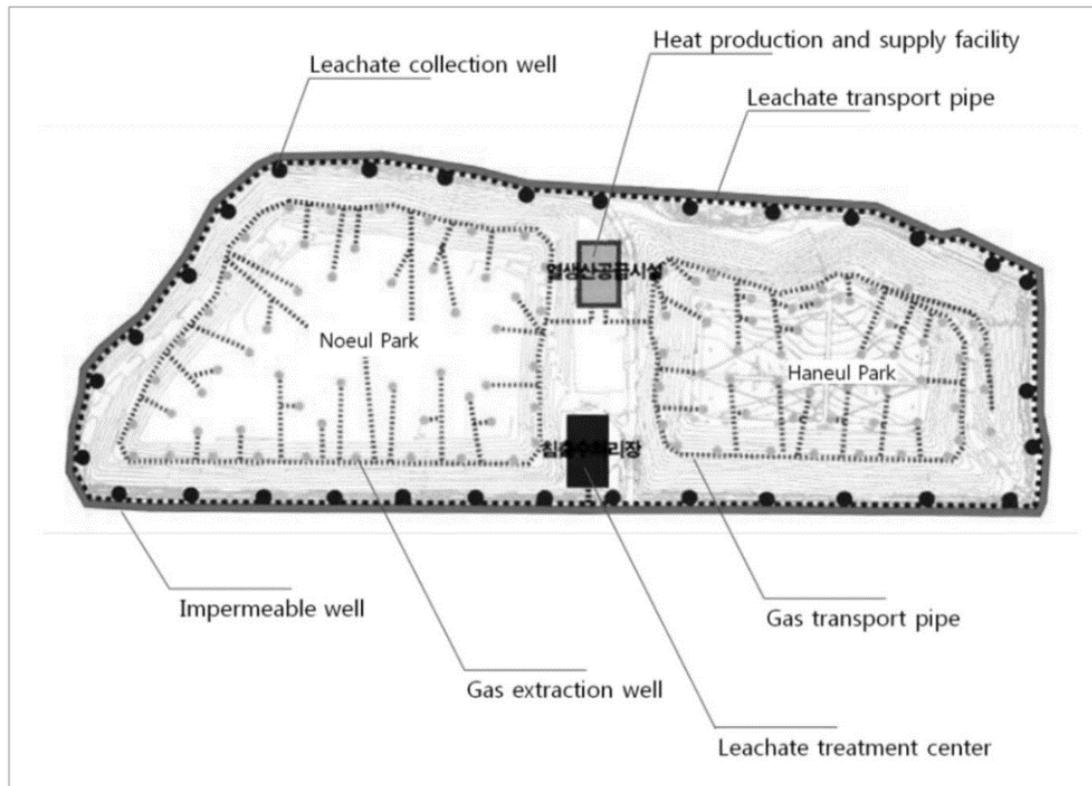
Master Plan of stabilization work. Source: (Kee-young et al., 2014)
